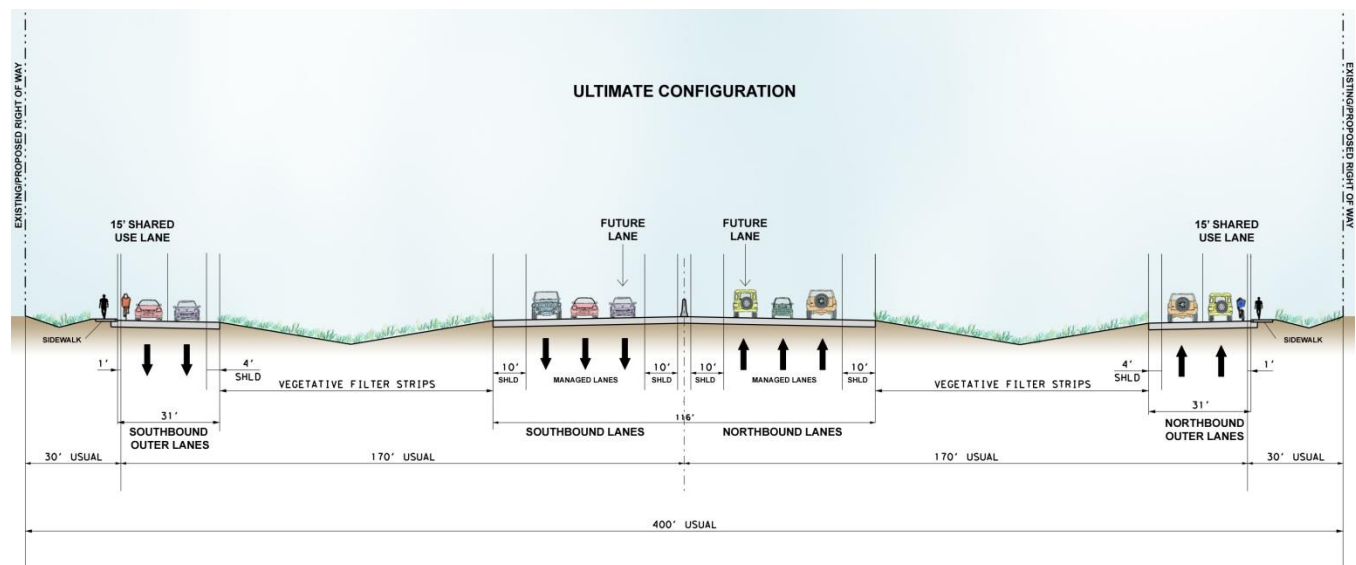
Proposed project typical section south of Stone Oak Parkway
